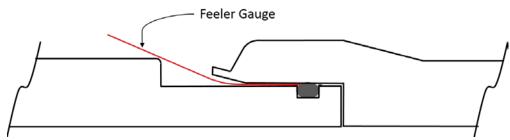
Spigot groove with feeler gauge used to locate O-ring gasket
